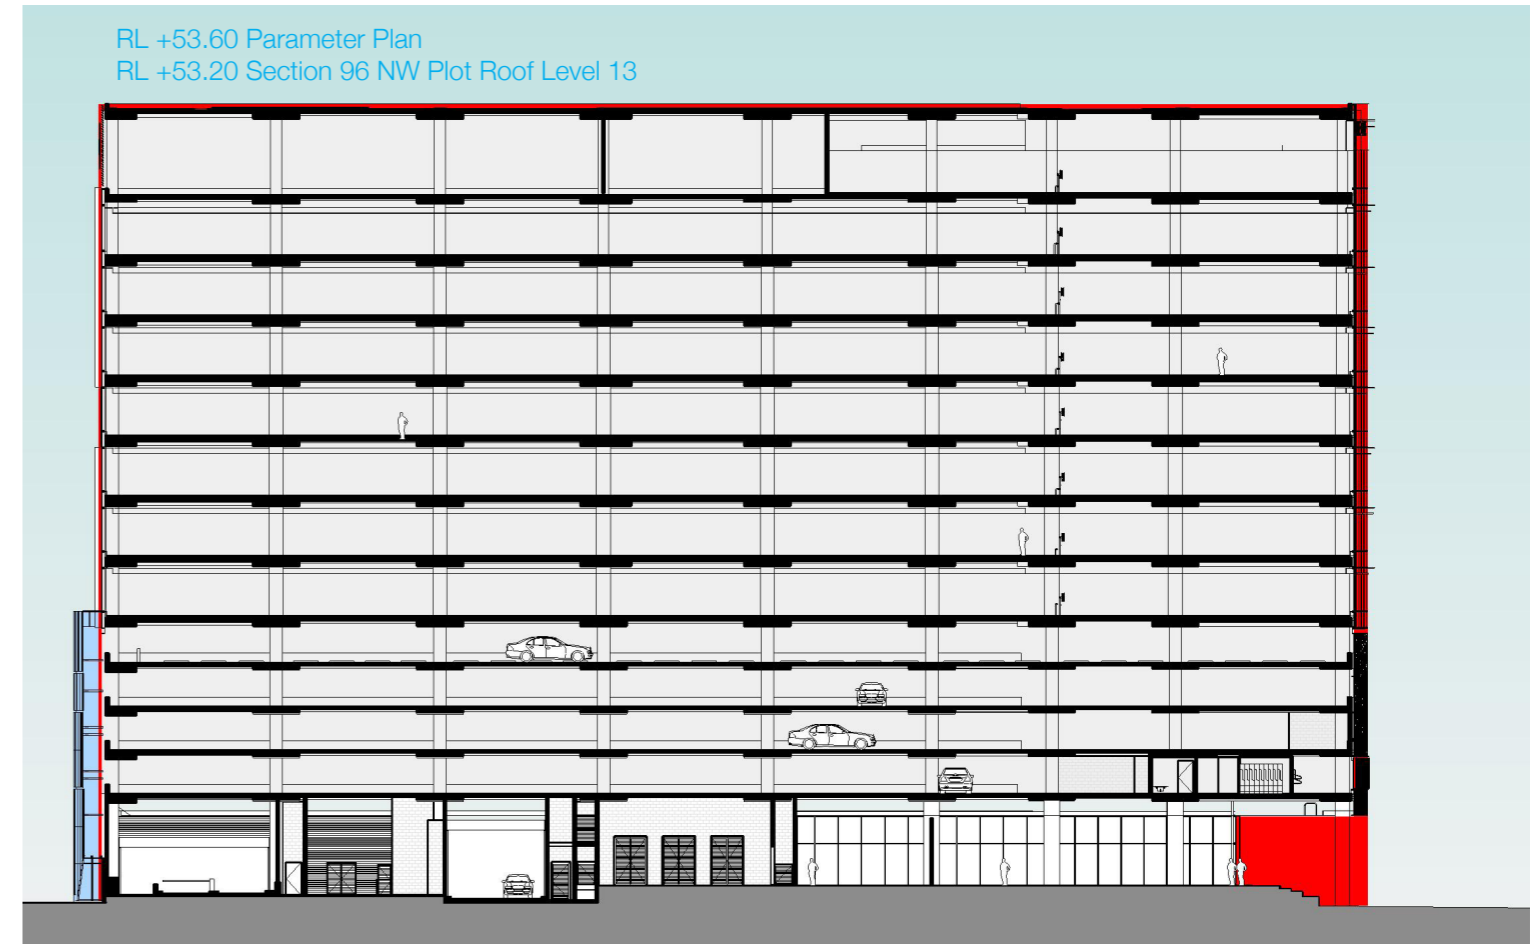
Section 96 NW Plot proposed building east west section with Parameter Plan envelope overlay
